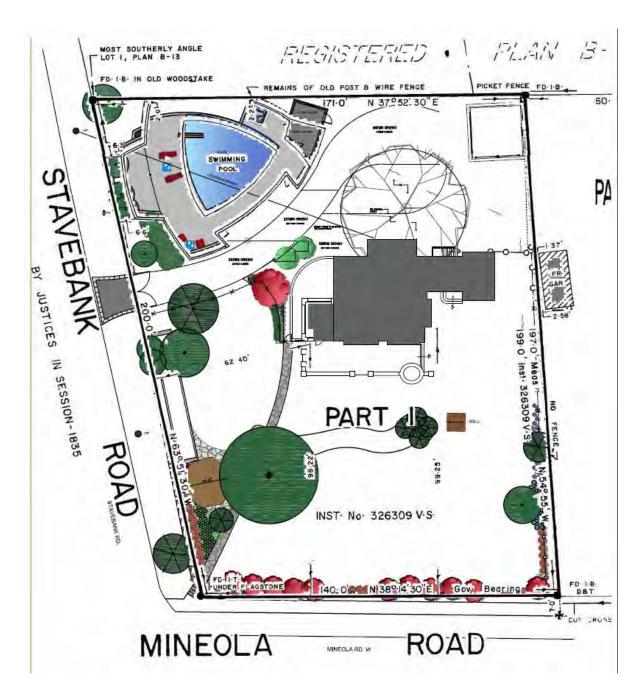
The current footprint of the residence at 1341 Stavebank Road. (Image from owners.)
